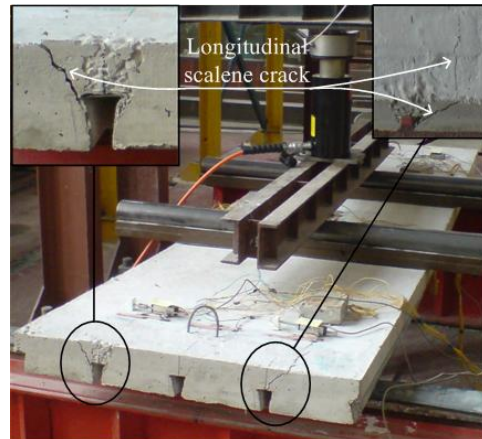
Composite steel – concrete slab in the test setup after the failure
